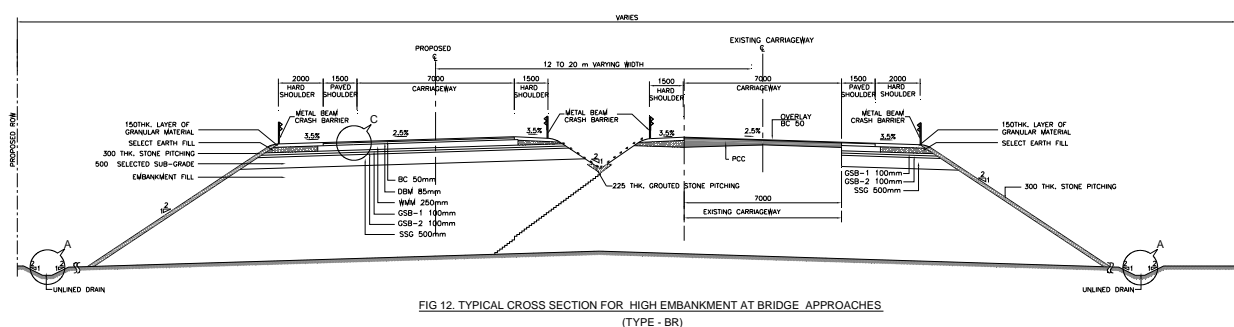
Typical Cross-Sections for High Embankment at Bridge Approaches (Type-BR)
